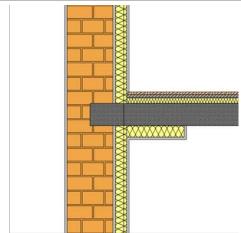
Minimizing thermal bridges through interior insulation along partition elements (in this case – a concrete slab)
